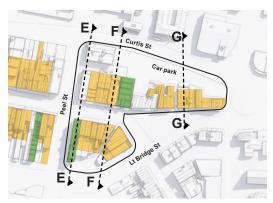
Built form test of street wall, setback and upper level heights- Section E
